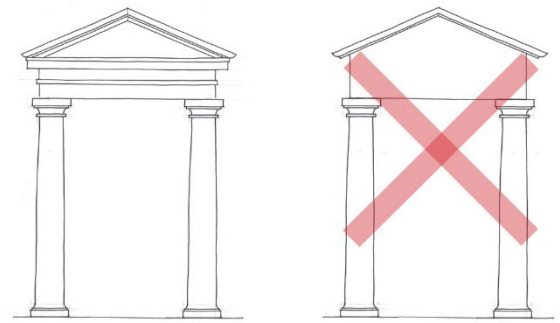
f.3.v.a2: Columns spanned by a visually structural element
